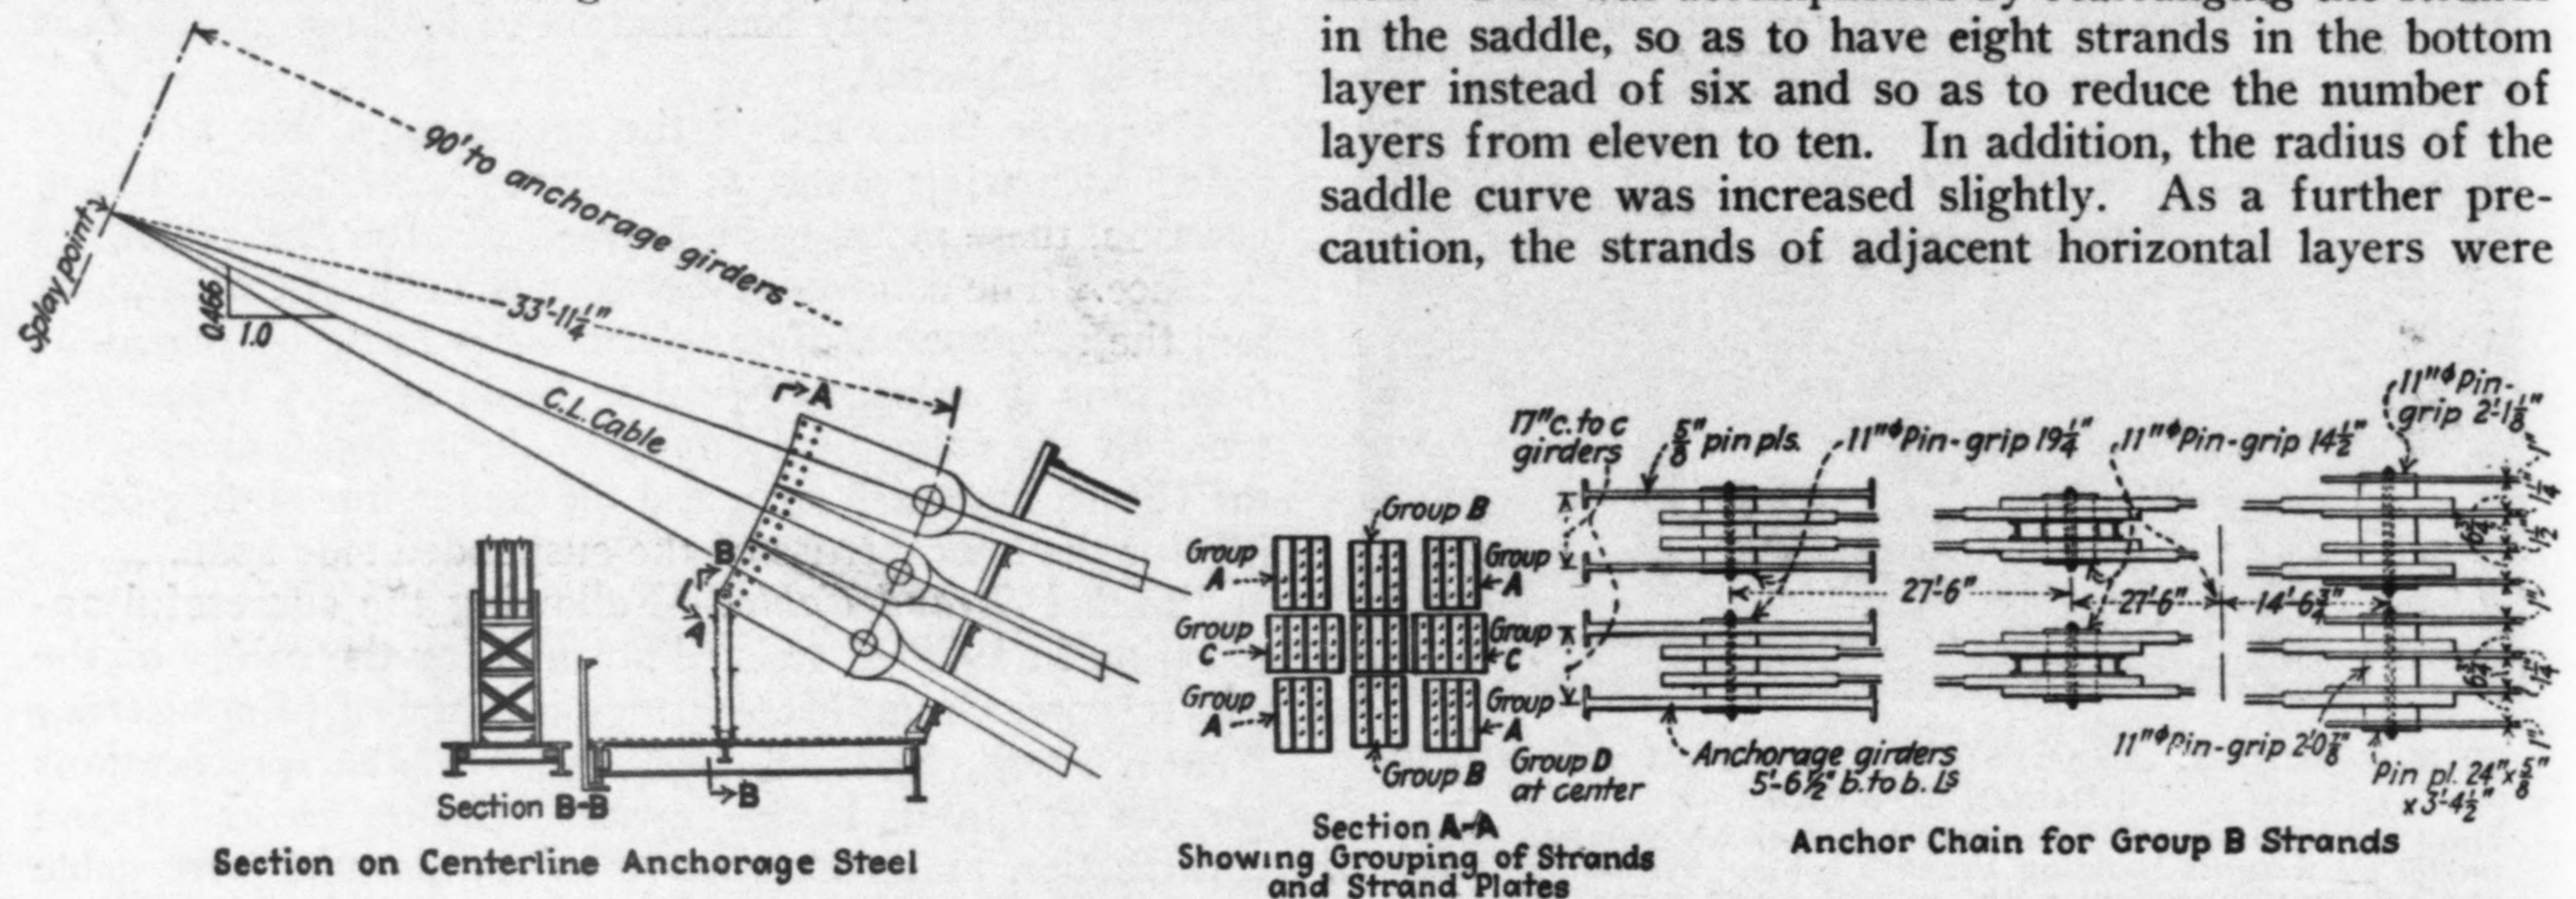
ANCHORAGE STEEL FOR ROPE-STRAND CABLES
